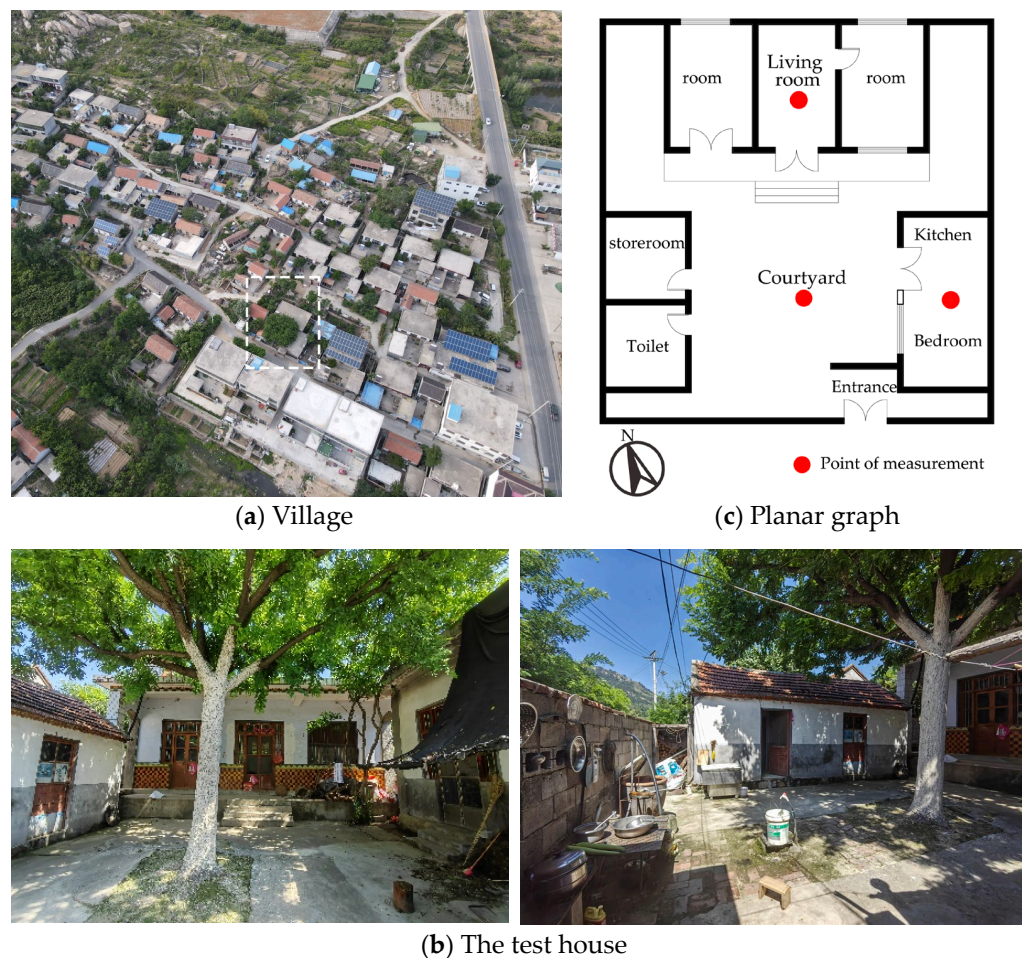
Photos of the test house. (a) shows an overview of the village where the test house is located; (b) shows actual photographs of the test dwelling; (c) depicts the floor layout of the dwelling.
